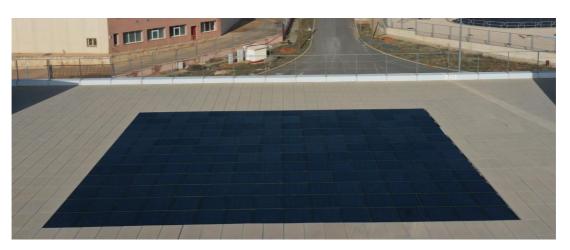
Demonstration site 1 – BIPV walkable floor. View from a drone
